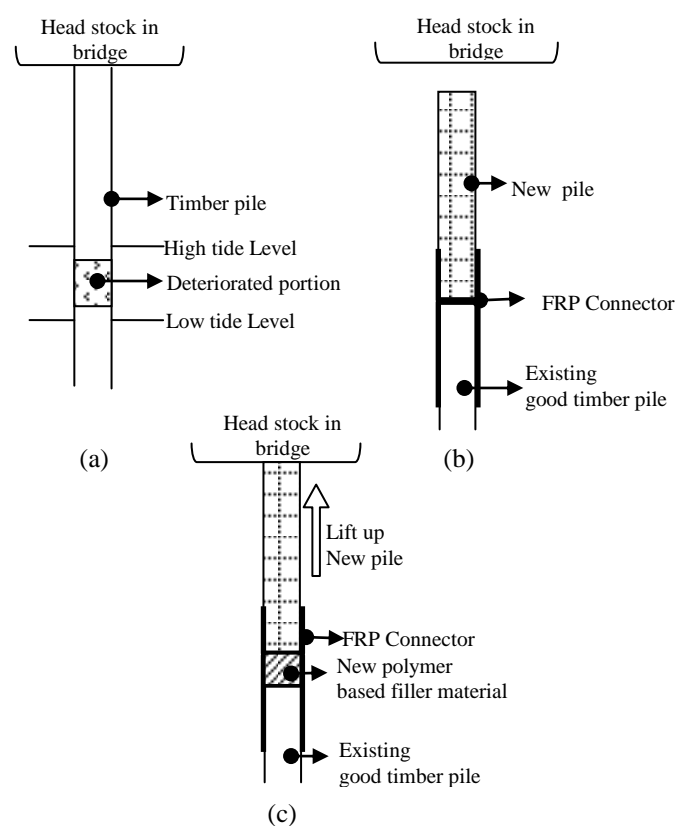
(a) General layout of the deteriorated timber pile, (b) Installing FRP connector and new pile in to the remaining non deteriorated timber pile, (c) Filling new polymer base filler material in to the connector.
